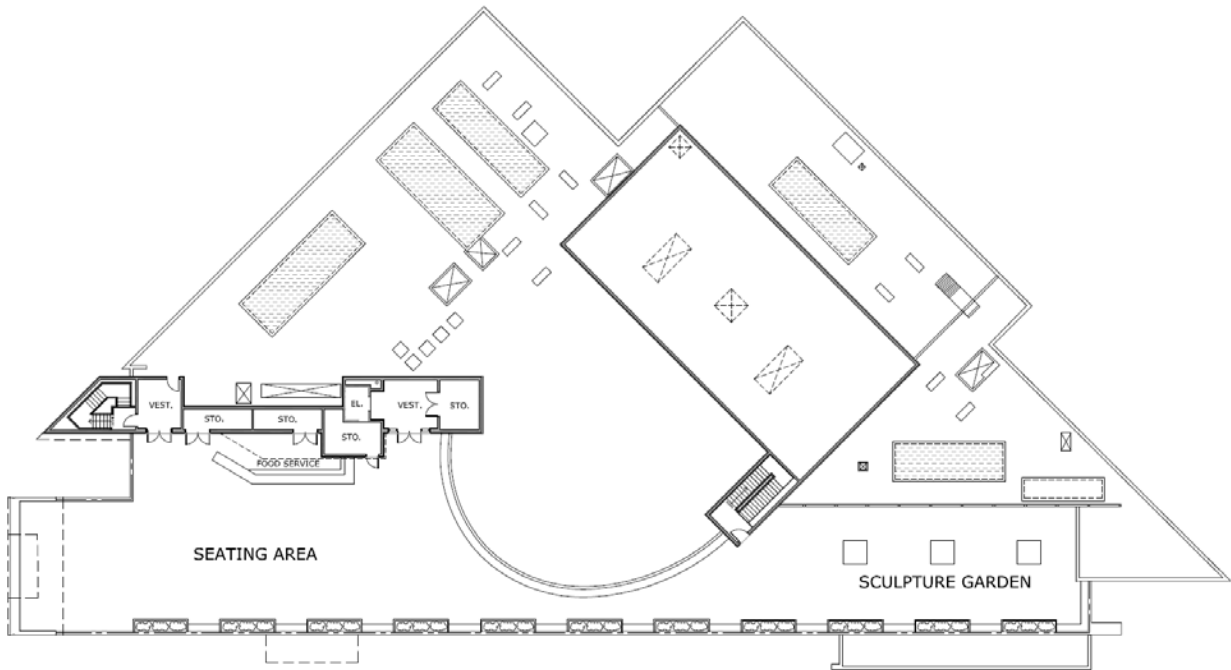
| Schematic plan of the Roof Terrace. Please see Appendix L for more detailed drawings.
